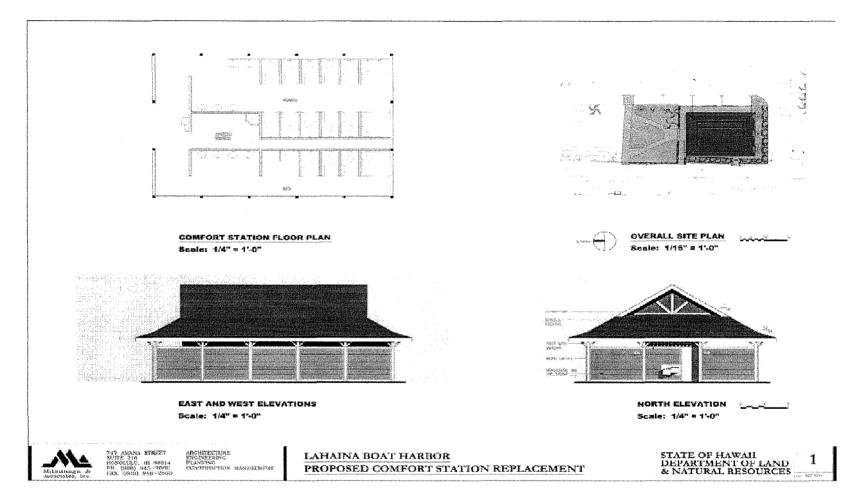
Replacement Comfort Station Plans (Provided by Mitsunaga & Associates, Inc.).
